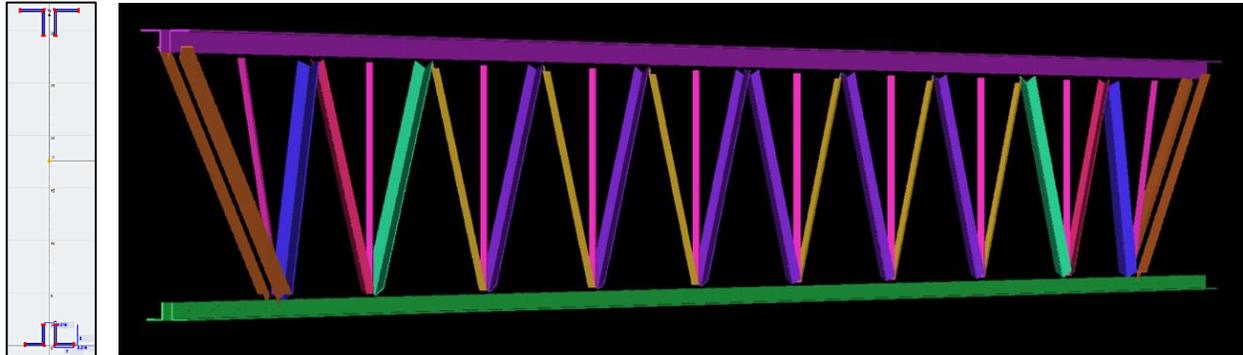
Angles Design chord cross-section and joist rendering, respectively
